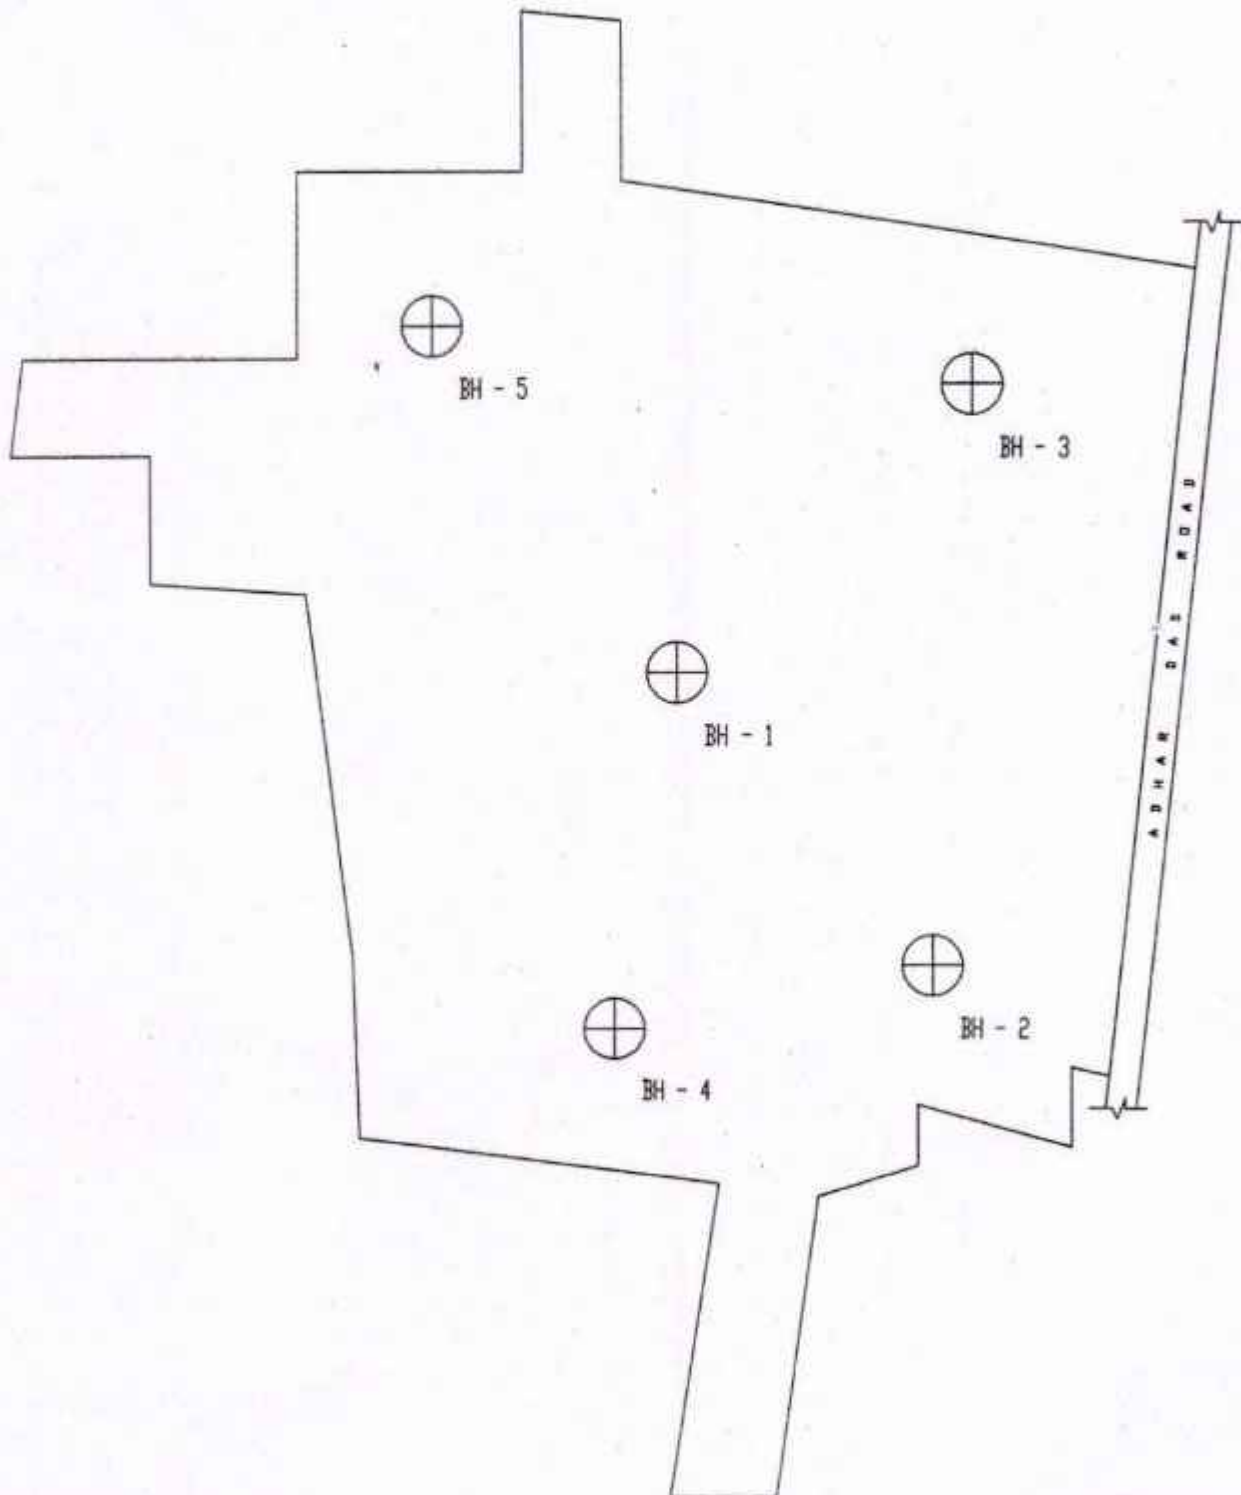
SCHEMATIC PLAN OF BORE HOLES.
